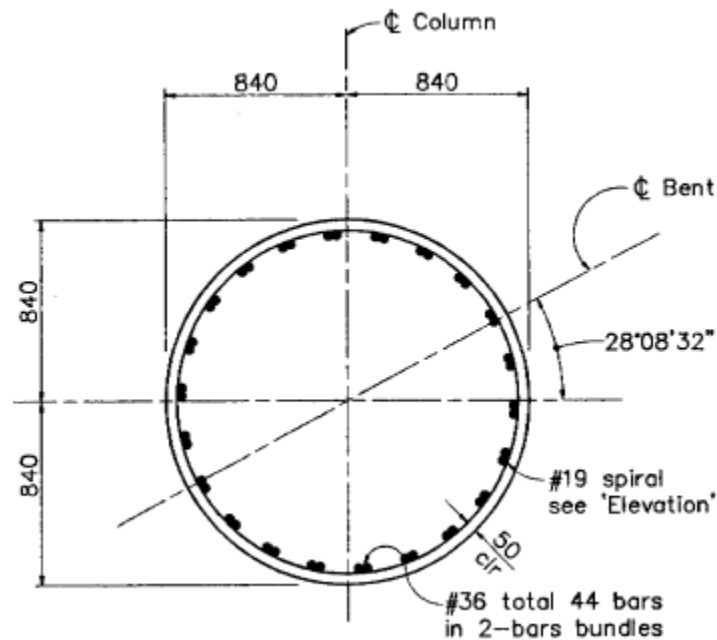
Cross-section of Bridge-A column (structural drawings by Caltrans)
